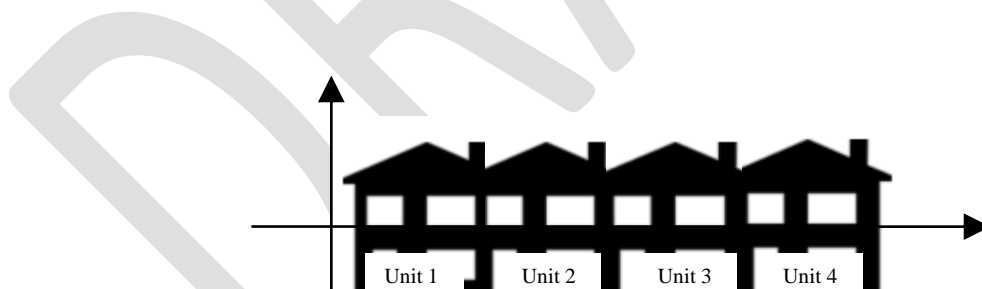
I: Linear Multi-Family Dwelling Arrangement
